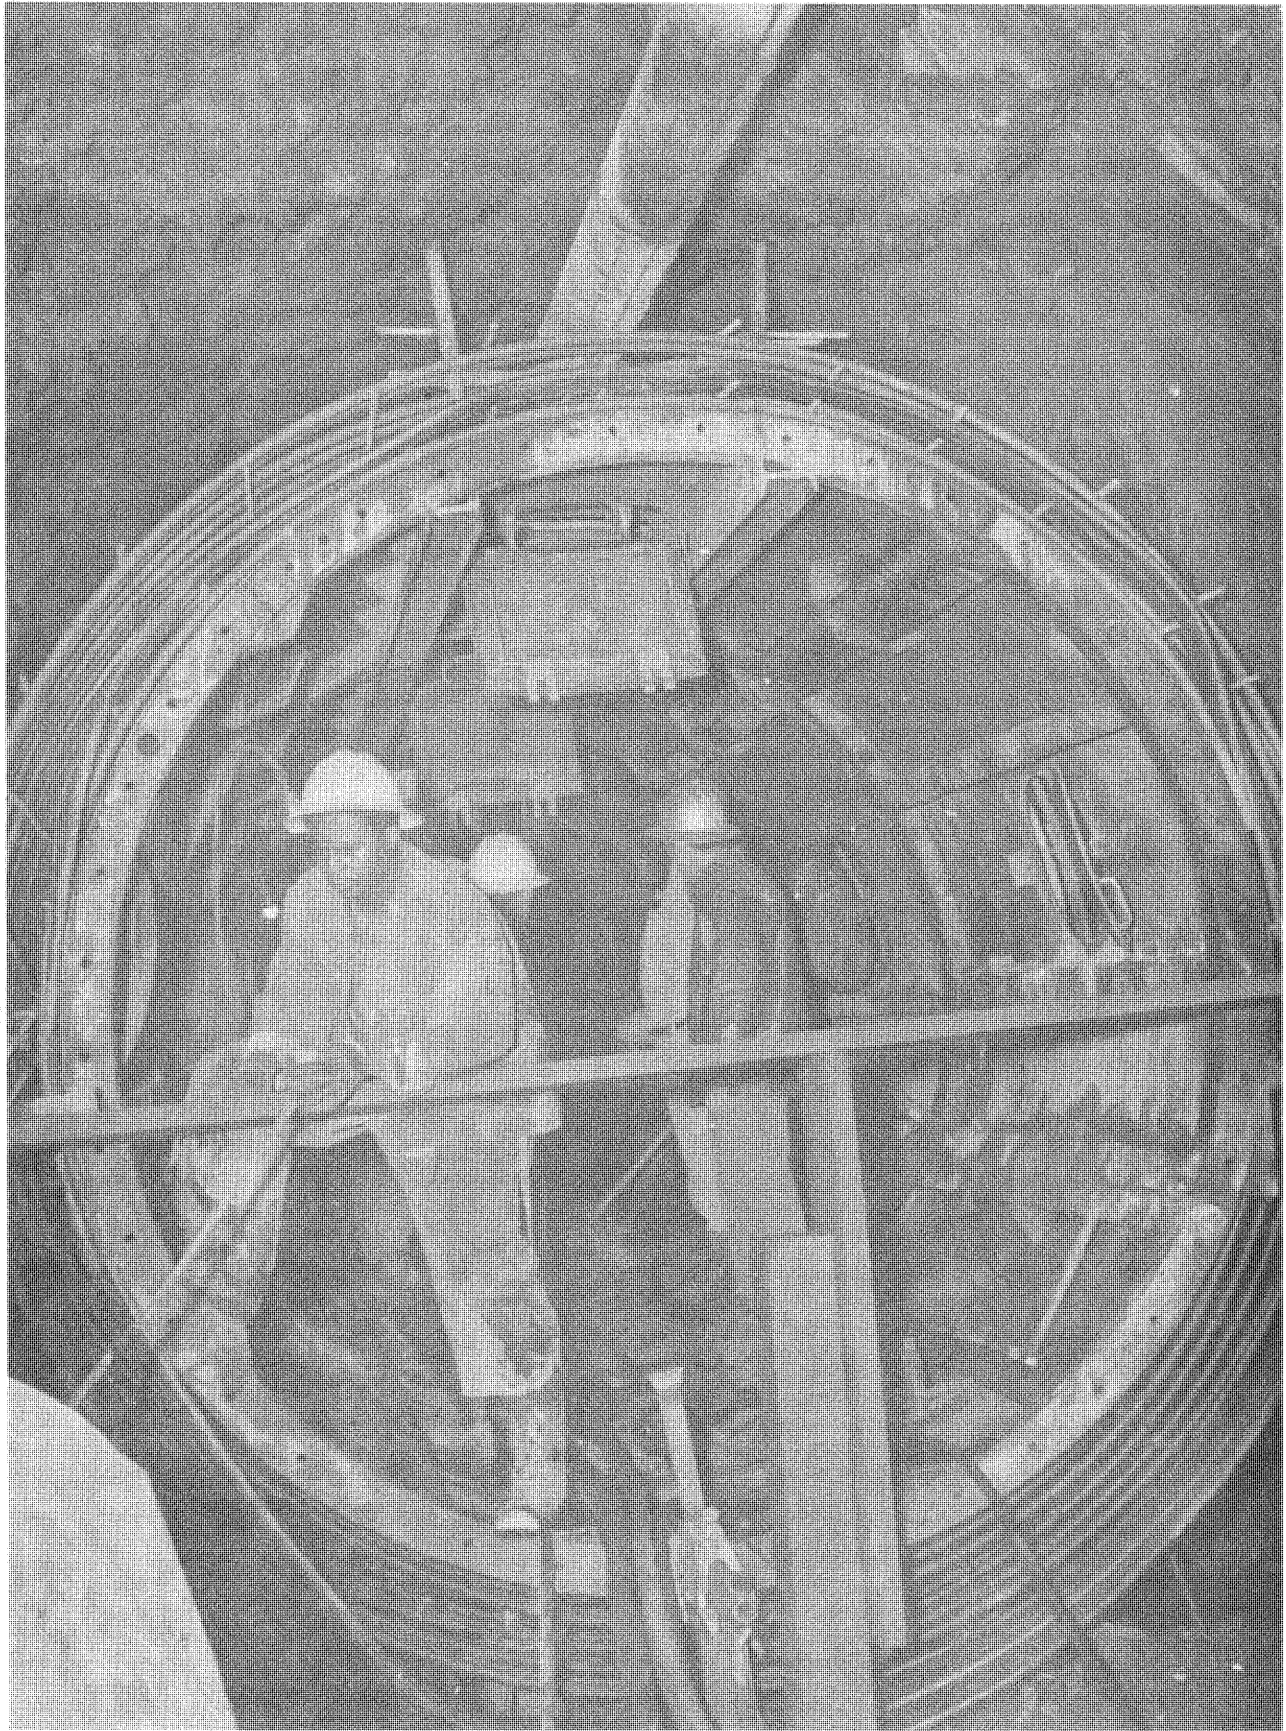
View of tunnel section showing reinforcement steel, steel forms, and rubber water stop. Pipe at top is pumpcrete slick line. P783-908-1001, July 24, 1952.
